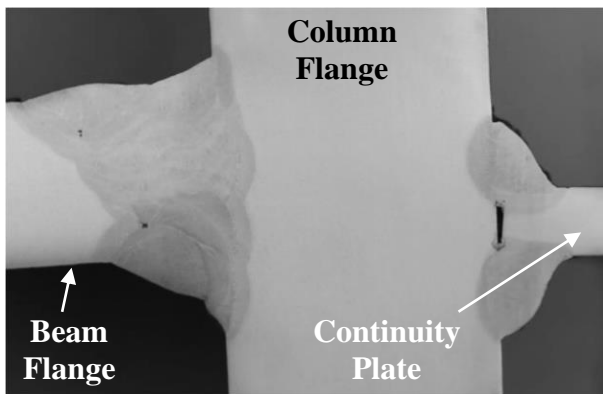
Macroetch of Specimen C3 Beam Bottom Flange CJP Weld
